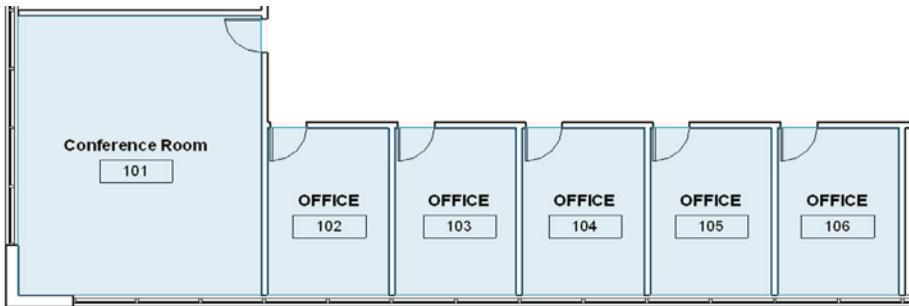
Room-based modeling – floor plan. (Source: IES/Revit 2010).
